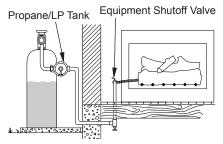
Checking Gas Joints (Propane/LP Gas Only)
